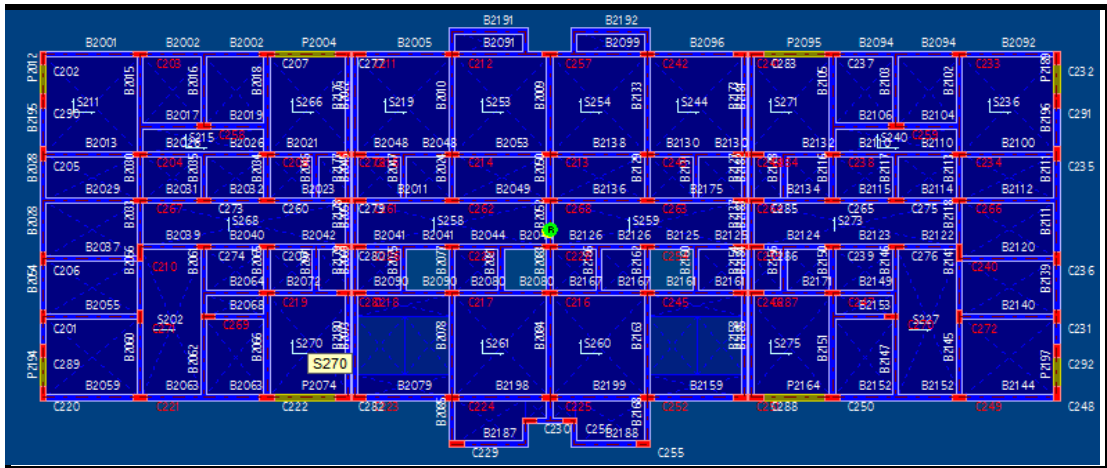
Plan of Buildings with Ten Stories and Stiffened Coupled Shear Wall
